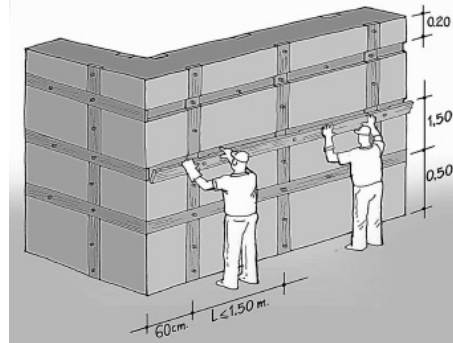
Configuration and installation of confinement wood elements (reprinted from Yamín *et al.*[3], with permission)
